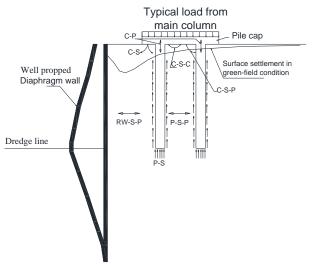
Typical interactions between soil and structural members [RW = excavation support structure; P = pile; S = soil; C = Pile cap)
